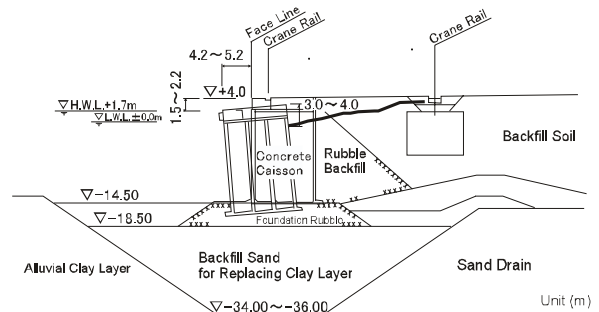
Damage to a caisson type quay wall (Rokko-Island -14m quay wall, Kobe port, Japan, 1995 Hyogoken-Nambu earthquake)
